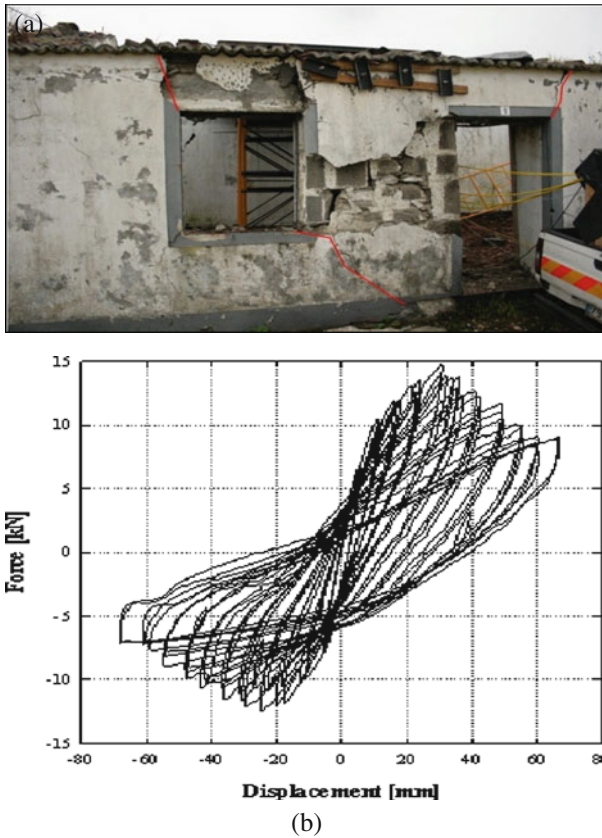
Building 1 out-of-plane test: a hysteresis loop; b final cracking pattern and collapse mechanism
